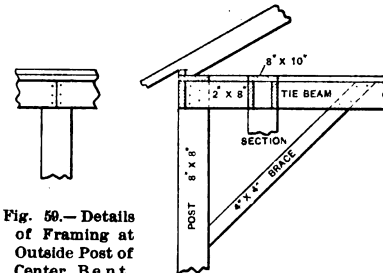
Details of Framing at Outside Post of Center Bent, with Tie Beam at Top of Post.—Scale, $\frac{1}{4}$ Inch to the Foot.
